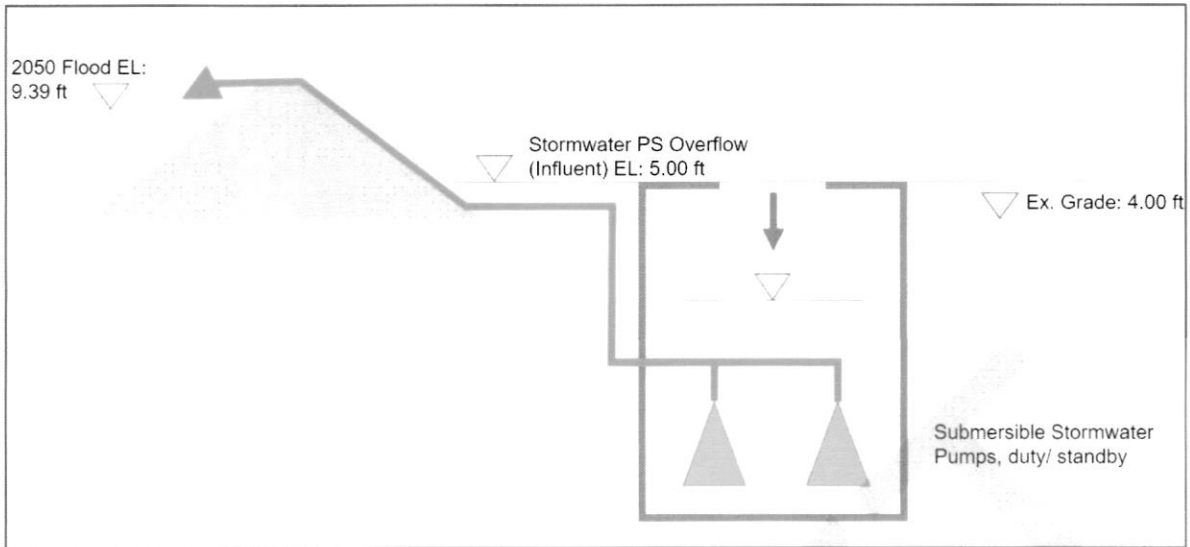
Option 1, Stormwater Discharge Pump Station Concept Arrangement, Section View
